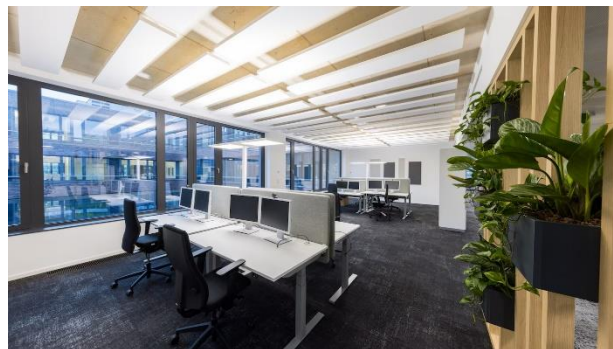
Typical office area with building equipment such as carpeting, free-hanging panels and wall absorbers.
